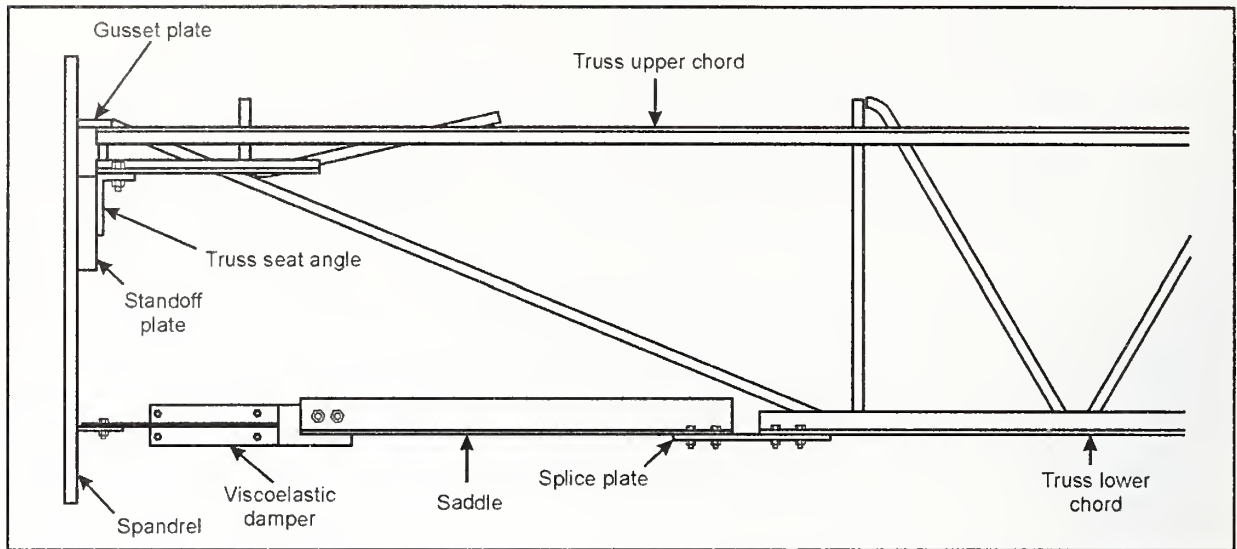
Diagram of floor truss showing viscoelastic damper.
